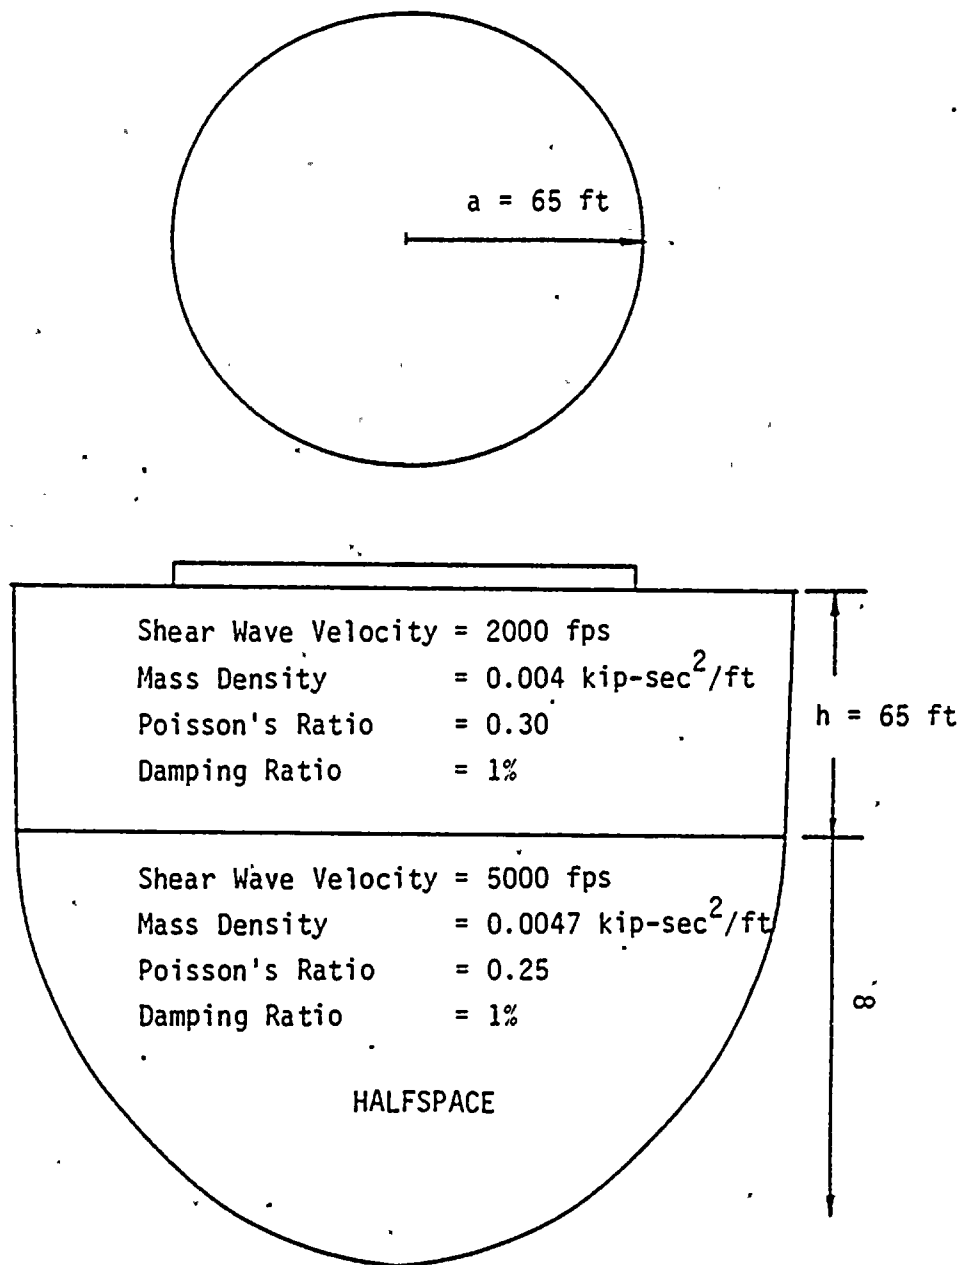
Circular Foundation on Two Soil Layered System
